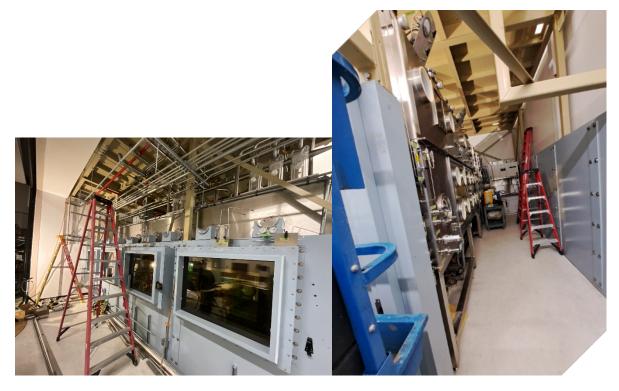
Photographs of MSTEC shield walls and glove box undergoing installation in FCF.
